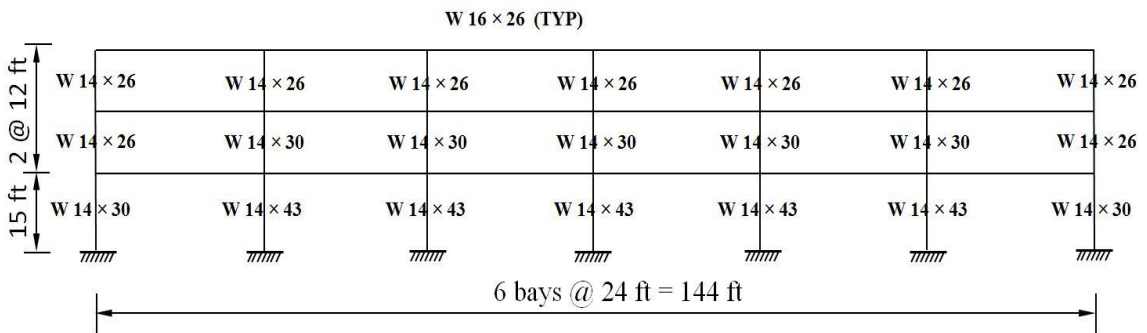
Elevation View of the Three-Story Structure in Atlanta
